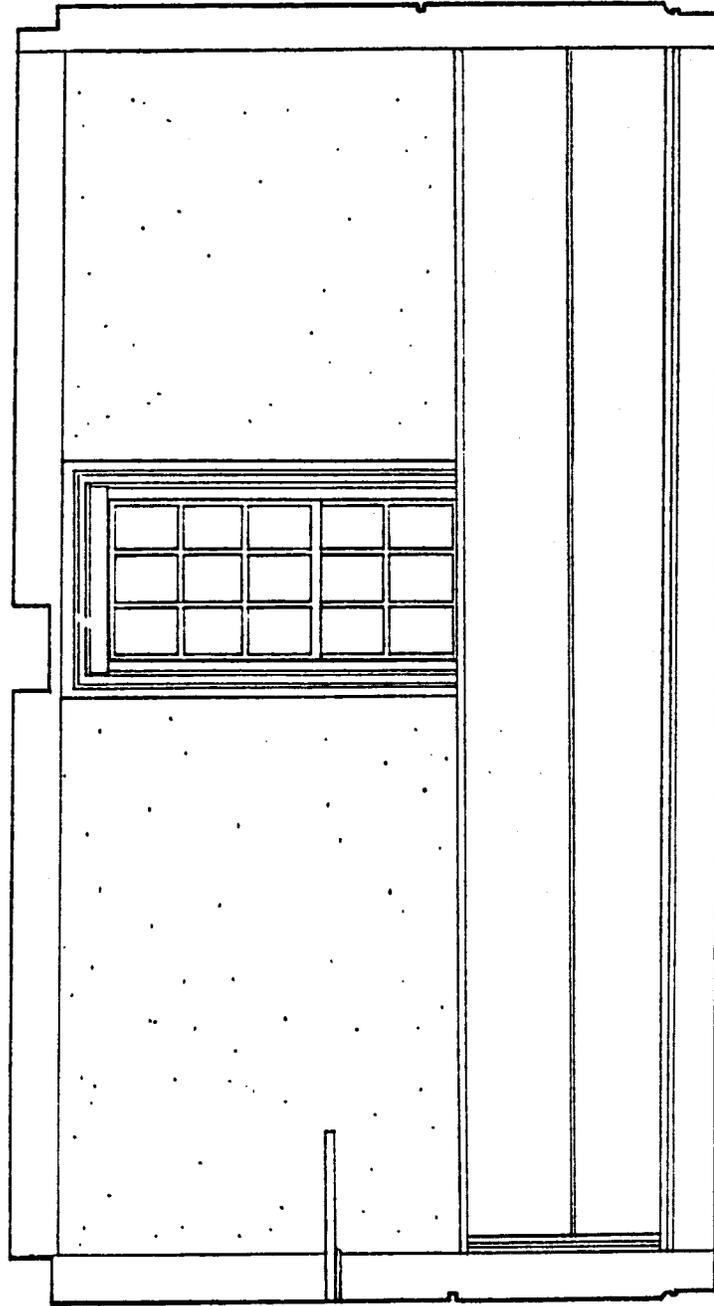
Atwood-Higgins House: East Front Room, East Wall.
